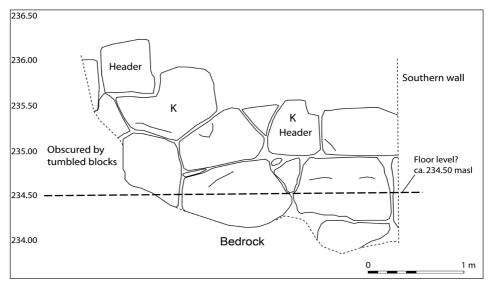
Eastern wall with the assumed original floor level at 234.50 masl. Header blocks and keyed blocks (K) are also marked.
